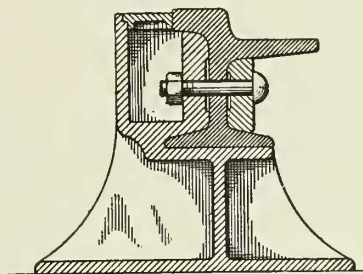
COMBINED JOINT BOX AND CHAIR.
